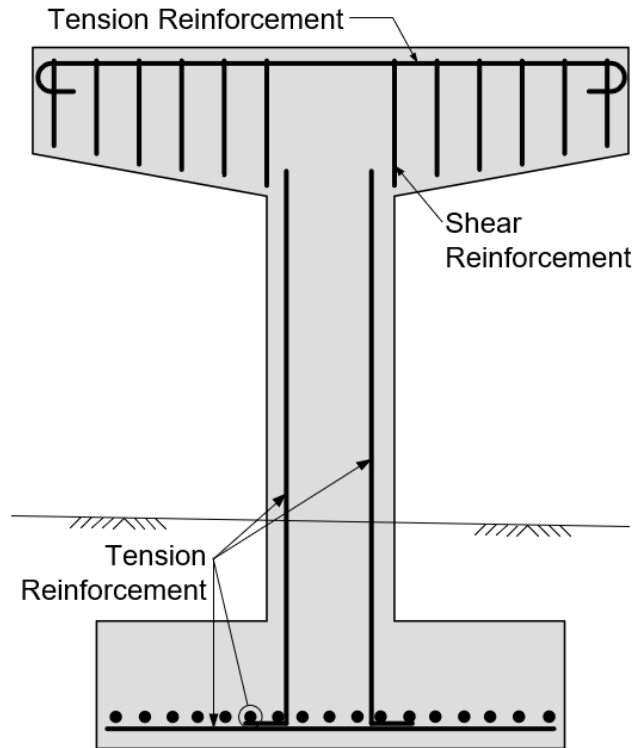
Primary Reinforcement for a Cantilevered Pier
